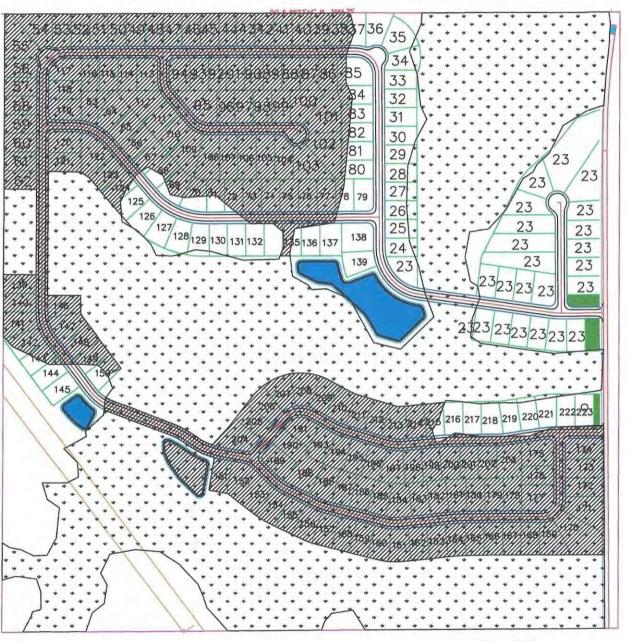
HUGER EGLIN ROAD SUBDIVISION PROJECT LAYOUT
